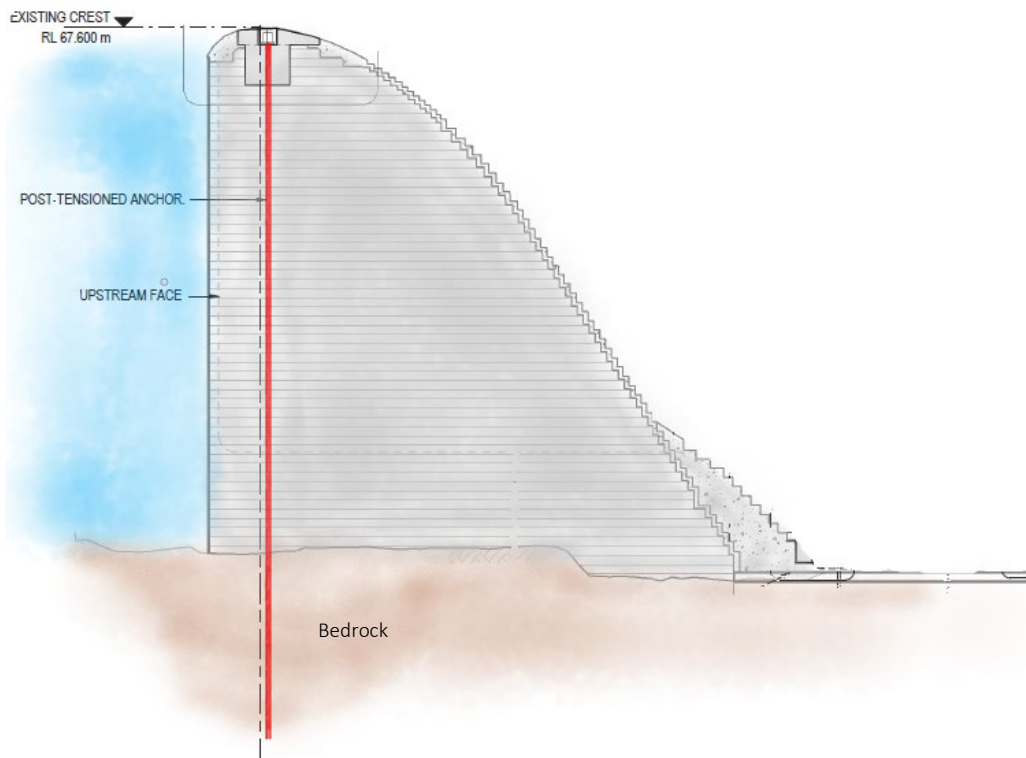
Stylised Paradise Dam Spillway section with post-tensioned anchor
